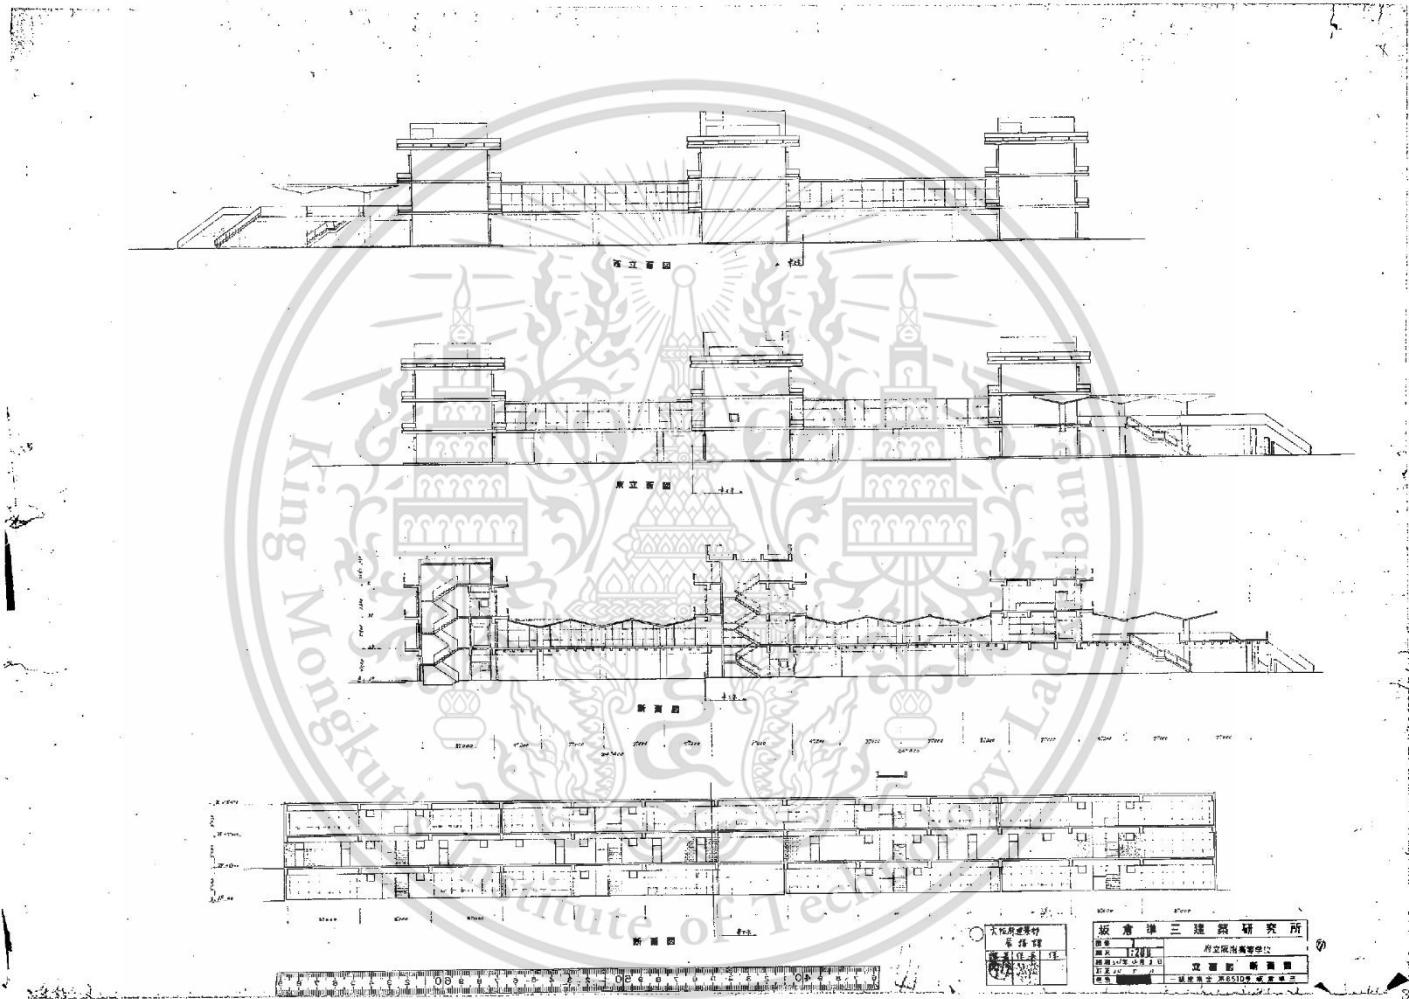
Elevation and section of Hannan High School (Source: Original drawing)
